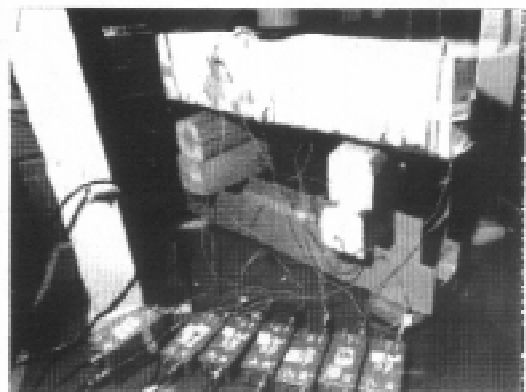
Experimental setup of three-point-flexure test and AE transducers for large concrete specimen.
